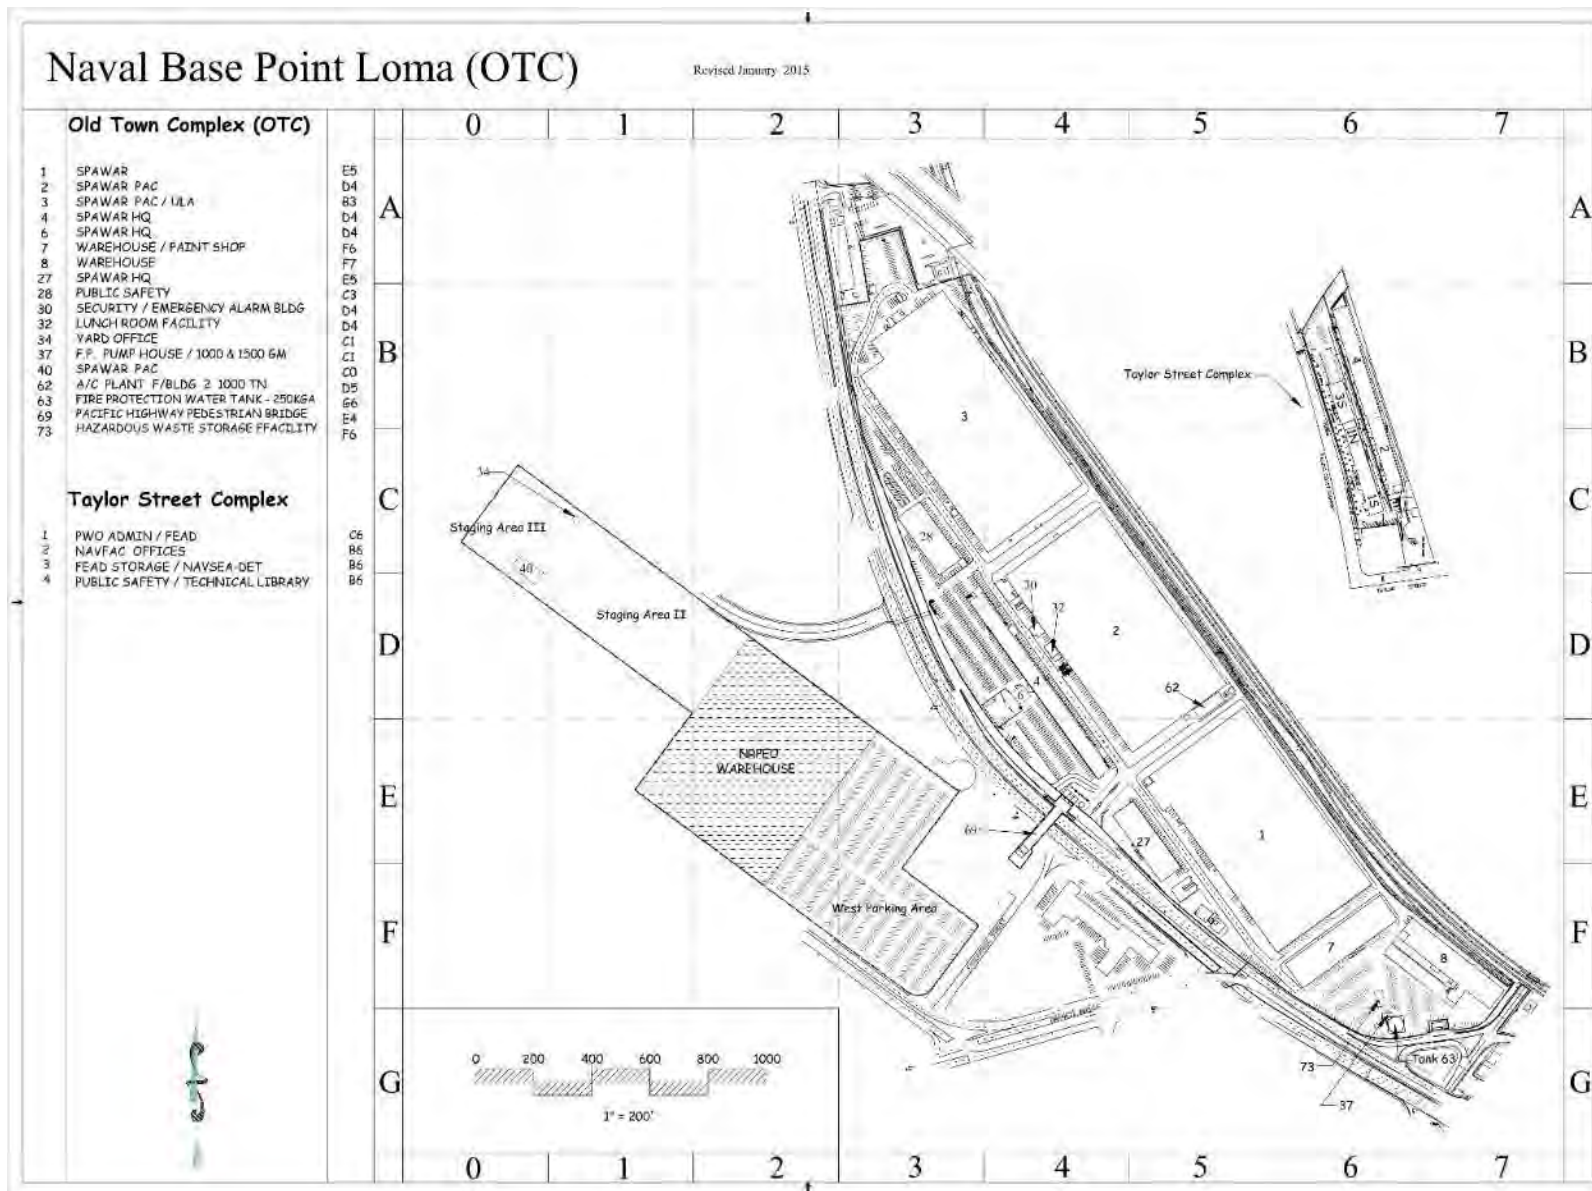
Site Plan of OTC Site 1, OTC Site 2, and TSC
